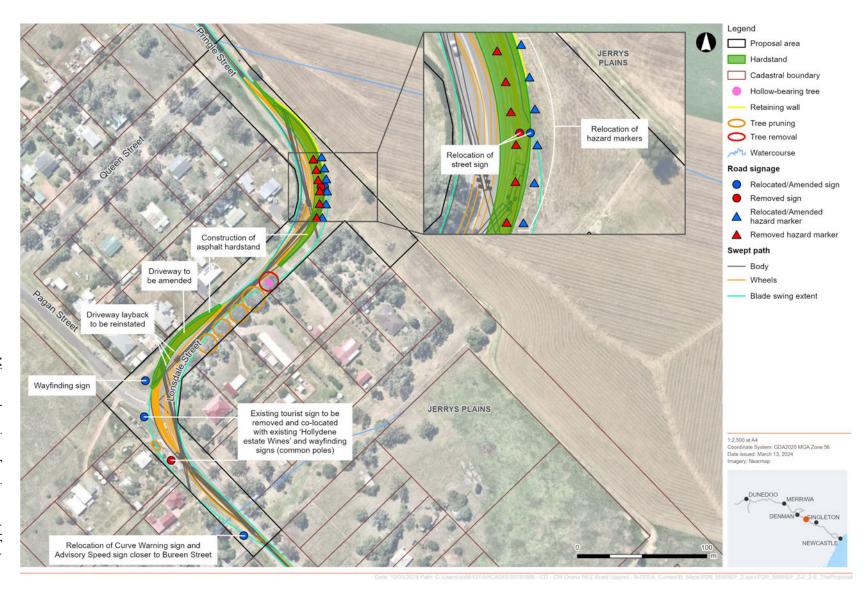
The proposal – Lonsdale Street and Golden Highway intersections, Jerrys Plains (H-009 and H-010)
